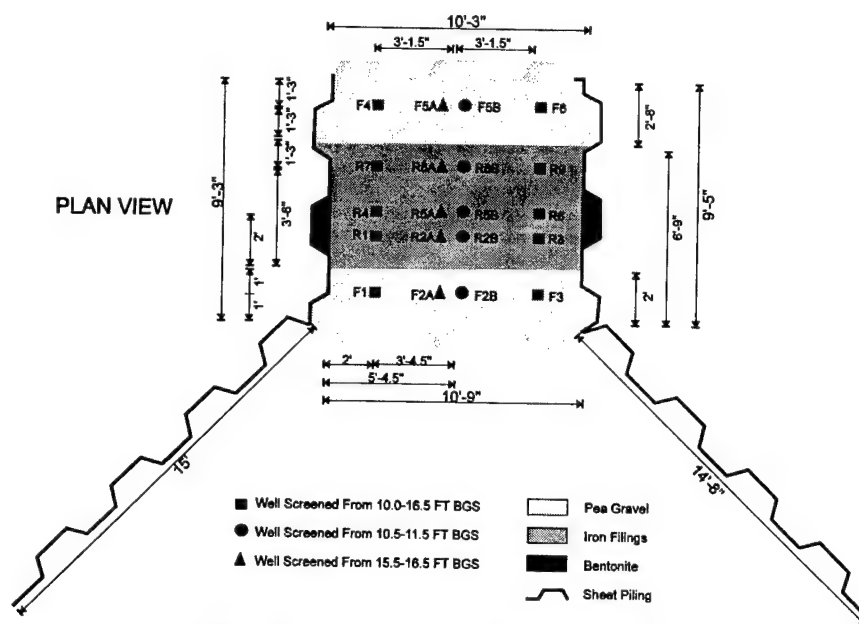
As-Built Treatment Wall Dimensions, Material Composition, and Monitoring Well Locations
